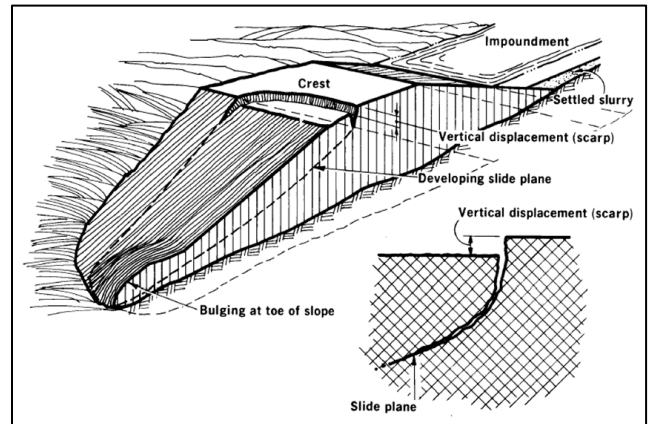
Longitudinal cracks on crest may be a sign of slope movement.
